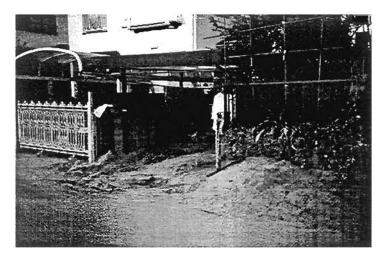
No apparent damage to the foundation of a bouse even large amount of erupted sands
